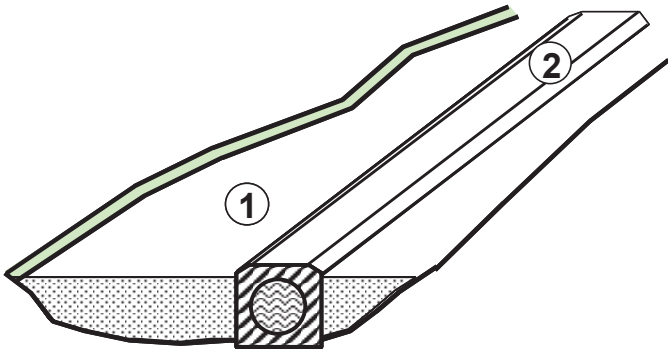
Diversion of river directly through construction site: ① dam foundation, ② concrete culvert or tunnel (Schleiss 2015)
